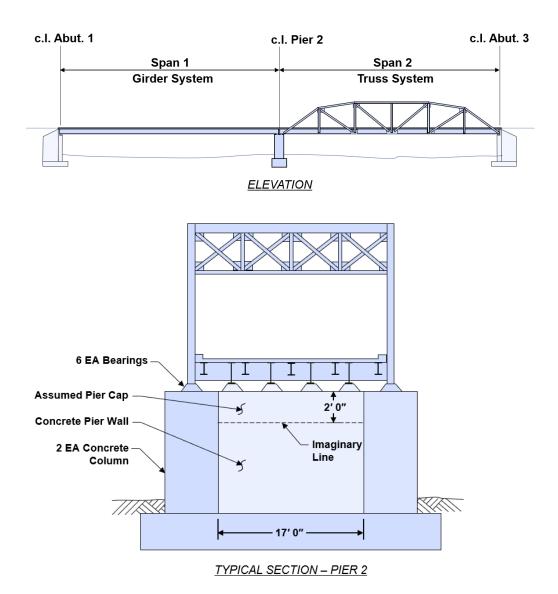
B—Elevation View and Typical Section (Pier 2) for Girder/Truss Bridge with Pier Cap Example
